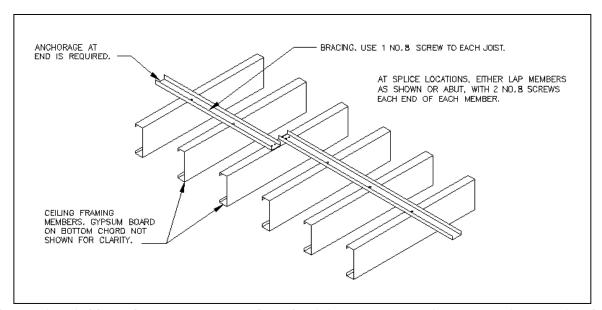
Ceiling Joist Top Flange Bracing with C-Shape, Track or Cold-Rolled Channel Section
